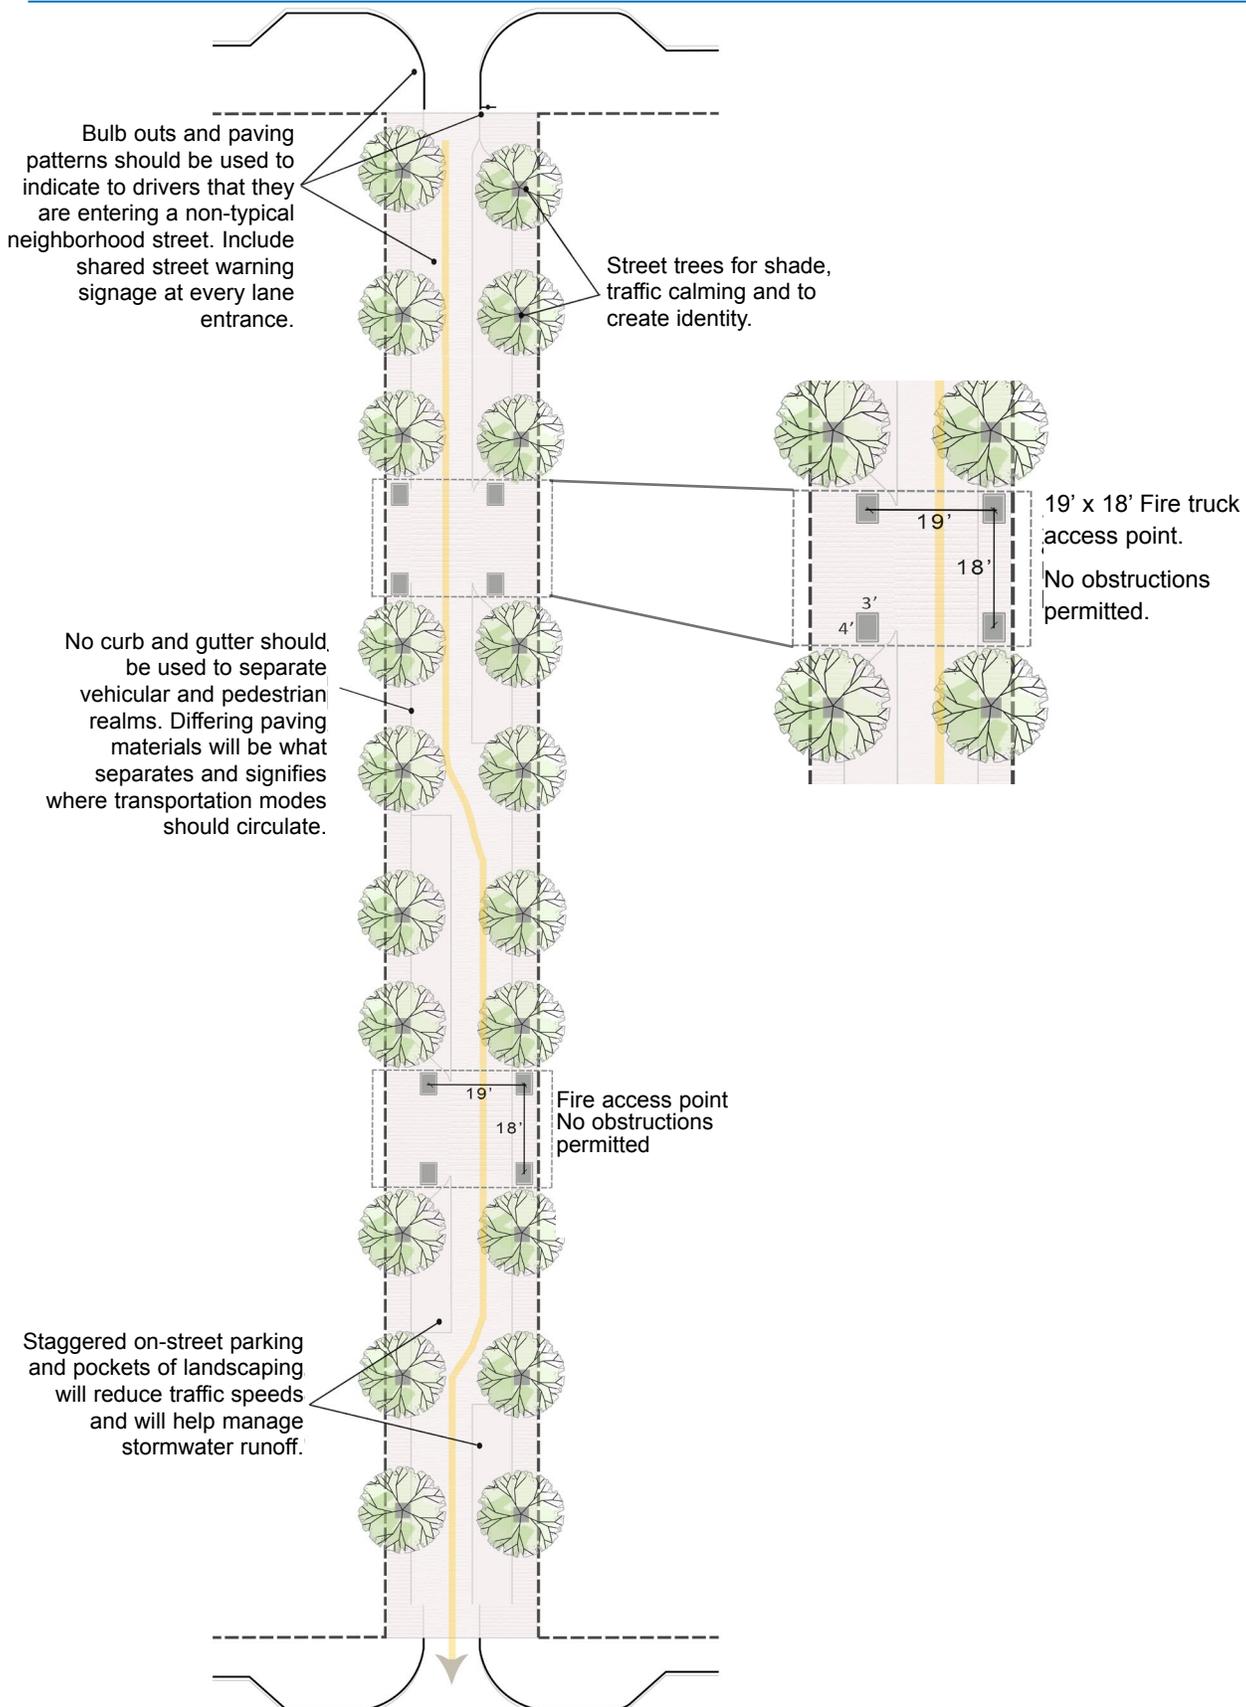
(3). Lane Plan View & Fire Access Bulb-Out
